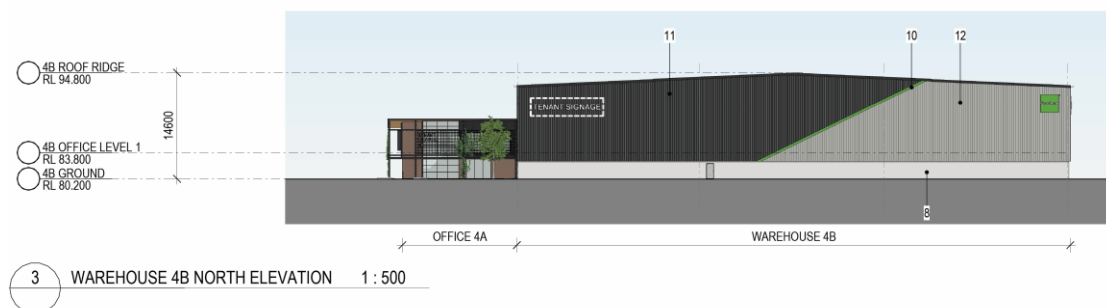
Warehouse 4B North Elevation (Source: SBA)
